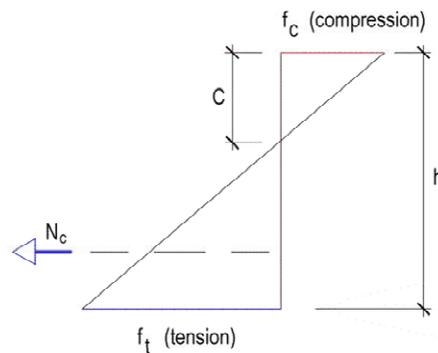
Computed Distribution of Stress over Concrete Section
